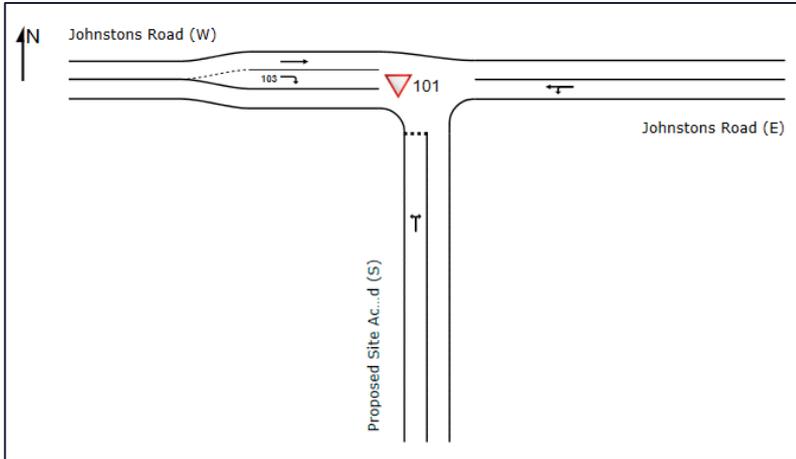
Proposed Johnstons Road and Site Access Road Intersection – SIDRA layout
